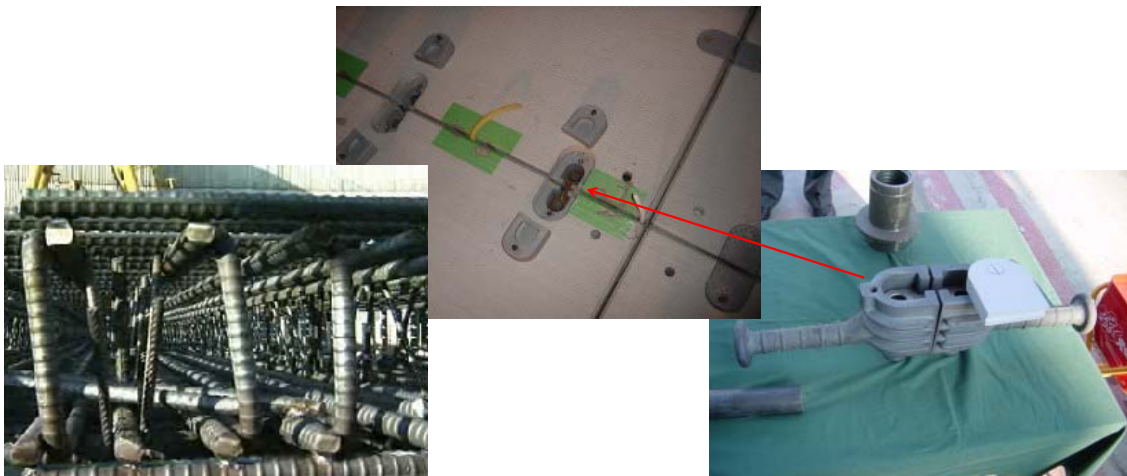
Lattice Truss and Cotter Joint for Japanese Precast Reinforced Concrete Pavement
